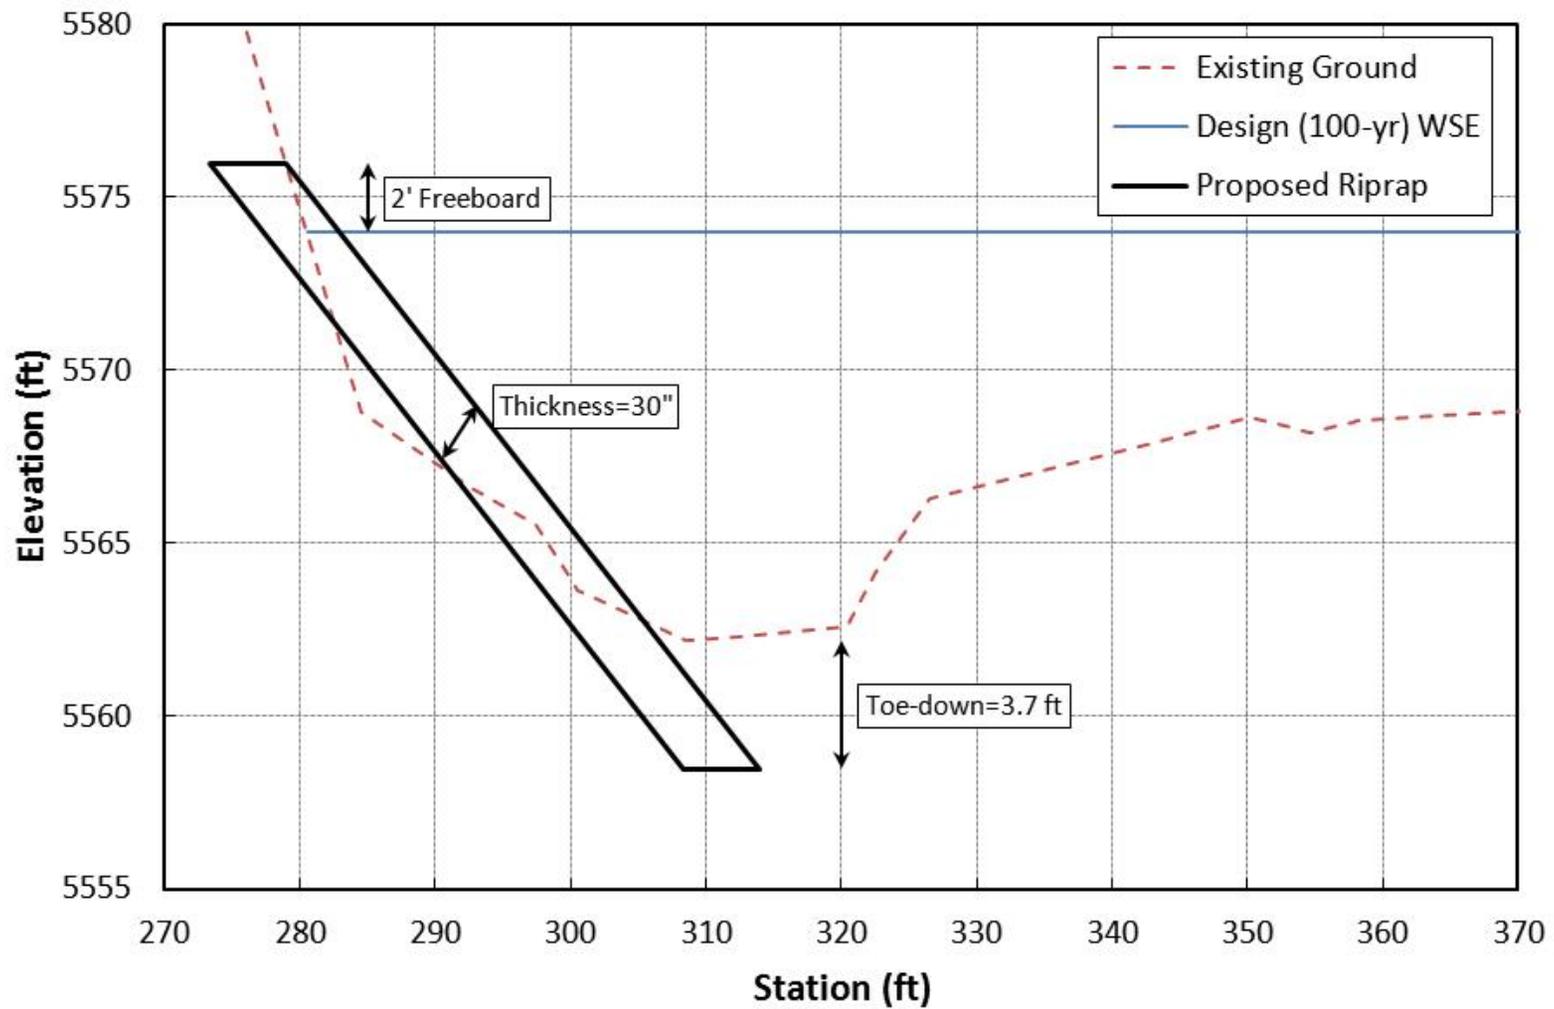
Cross Section 11338 showing typical dimensions of the recommended riprap revetments.
